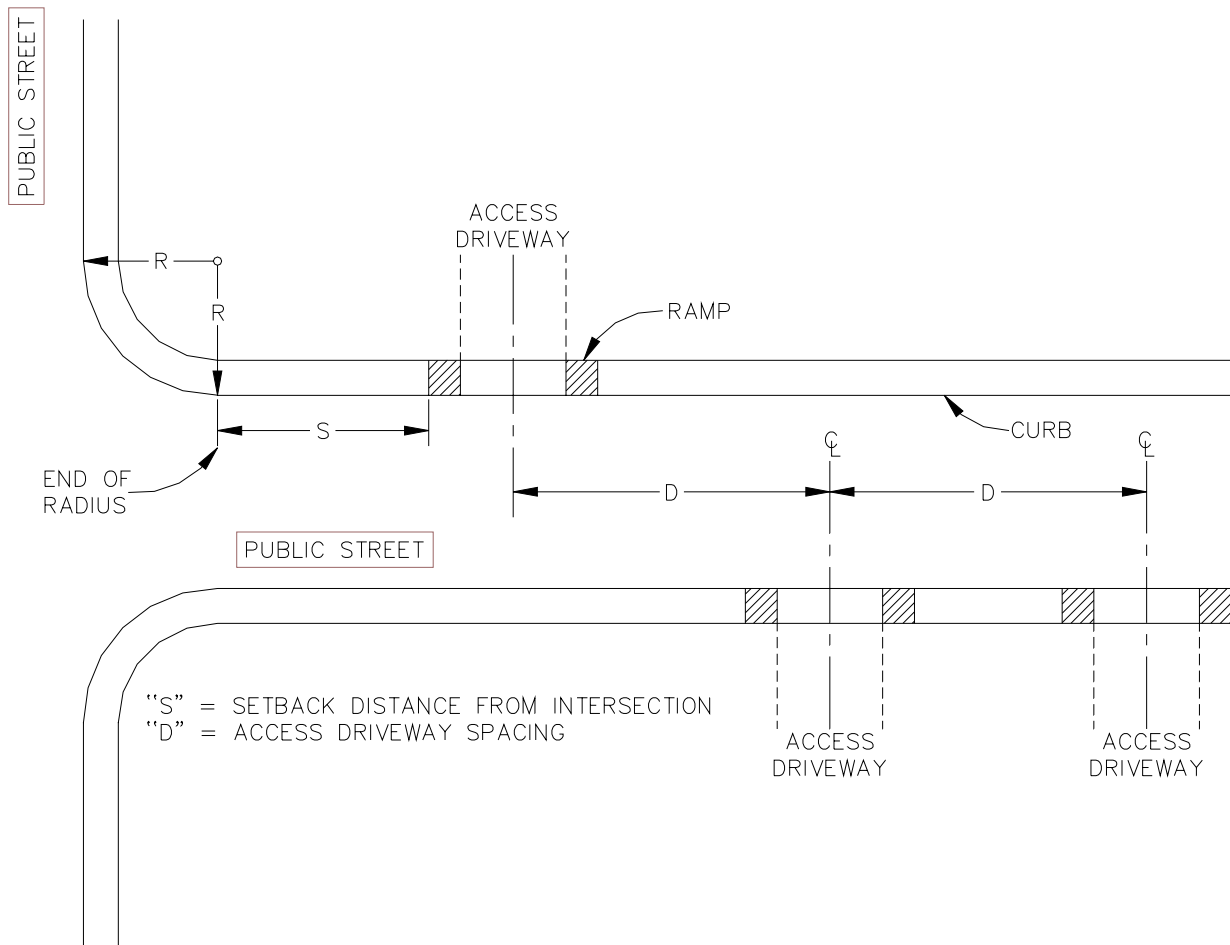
illustrates the definition of “access driveway spacing” and “setback from intersecting street.” As shown in Figure 1.2.1, the access driveway spacing is defined as the distance between driveway centerlines. The minimums apply both to driveways on the same side of the street as well as driveways on opposite sides of the street. Access driveways on opposite sides of the street should be located directly opposite each other, whenever possible. If not possible, the minimum access driveway spacing shall conform to Table 1.2.5. If these access driveway spacing standards preclude a frontage development from having an access driveway within their property, a driveway closer than the spacing standards with restricted turning movements can be considered through the variance process.
